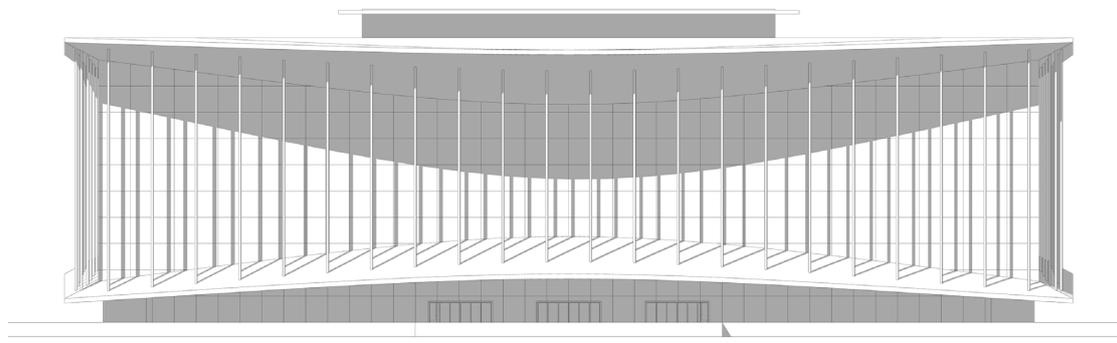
South façade of Xi'an Silk Road International Conference Center (drawn by author)
